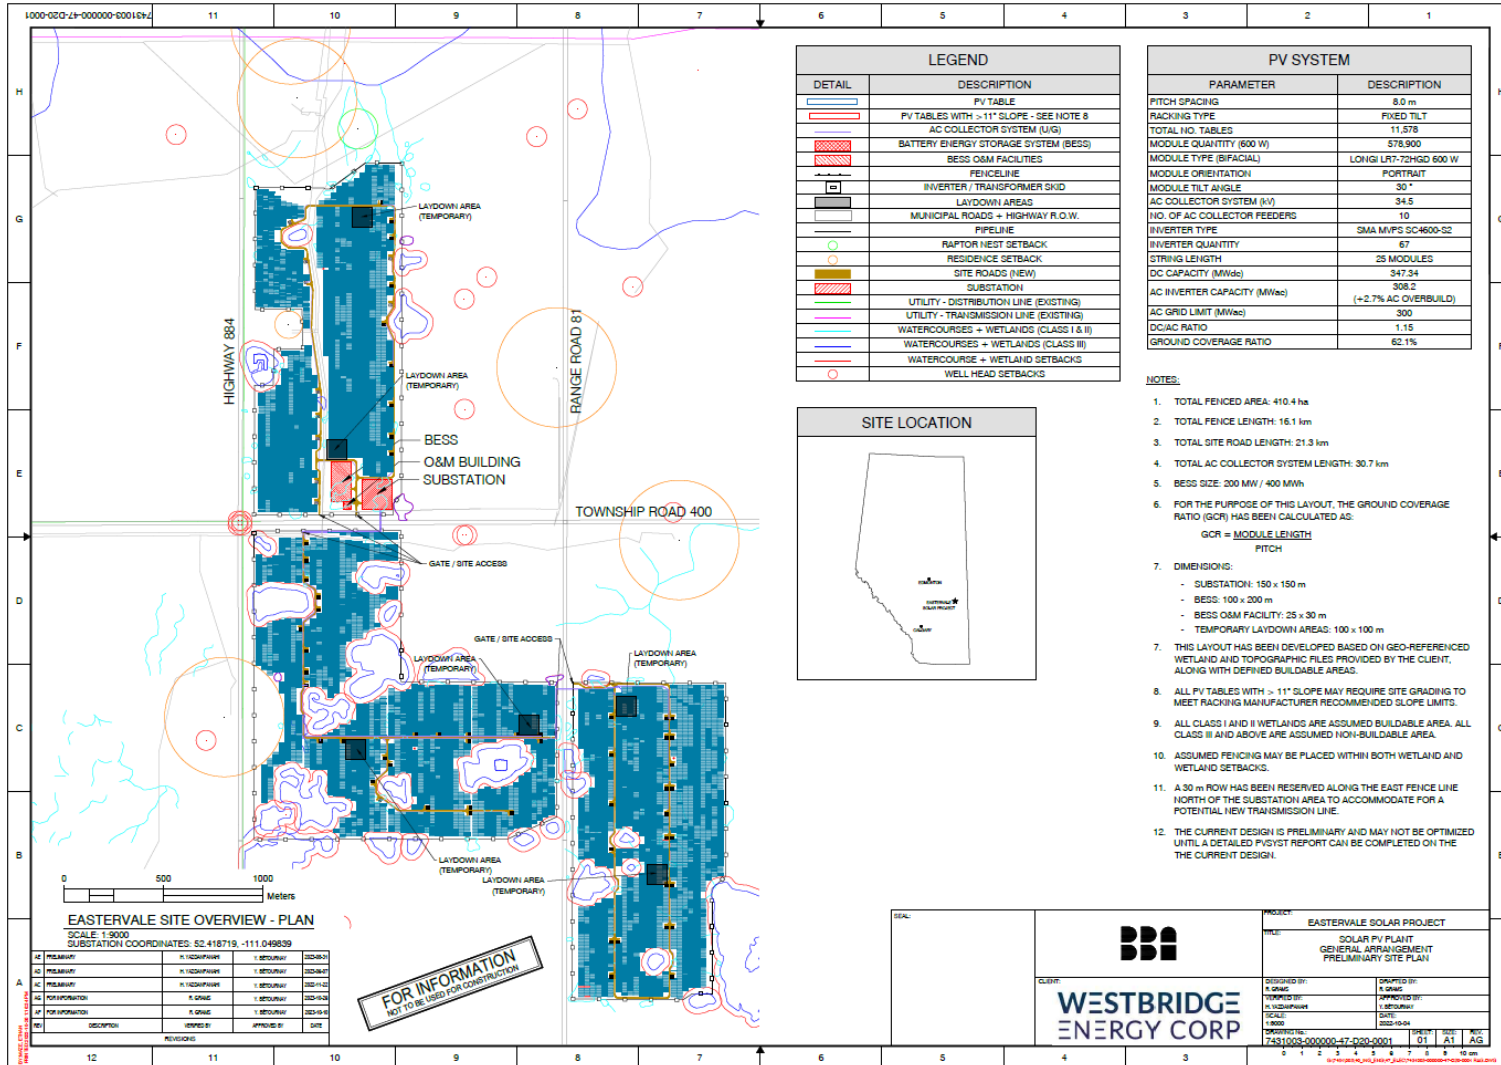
Project plot plan indicating proposed preliminary equipment and site survey.
